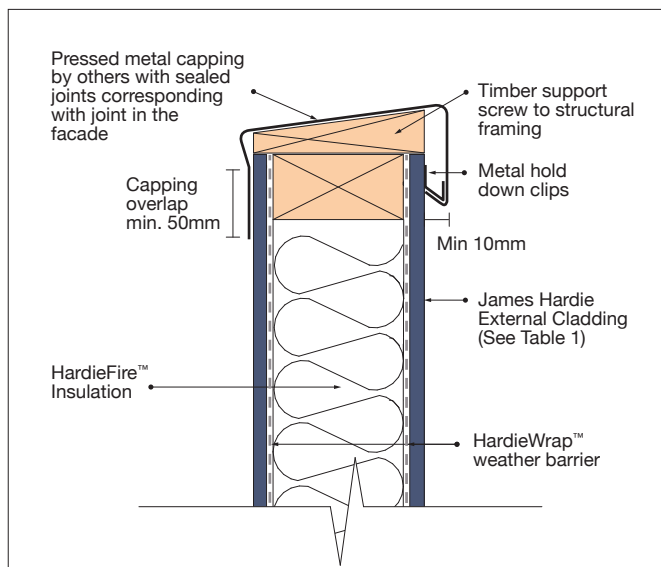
HARDIESMART™ BLADE WALL PARAPET
